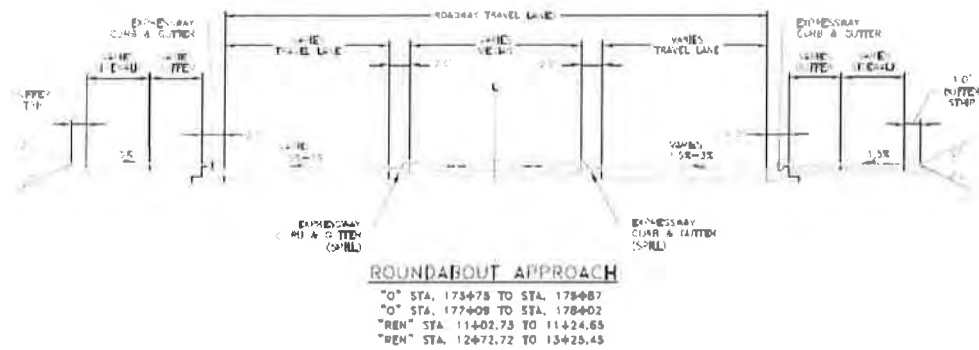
Typical Section – Renninger Street Roundabout Approach
